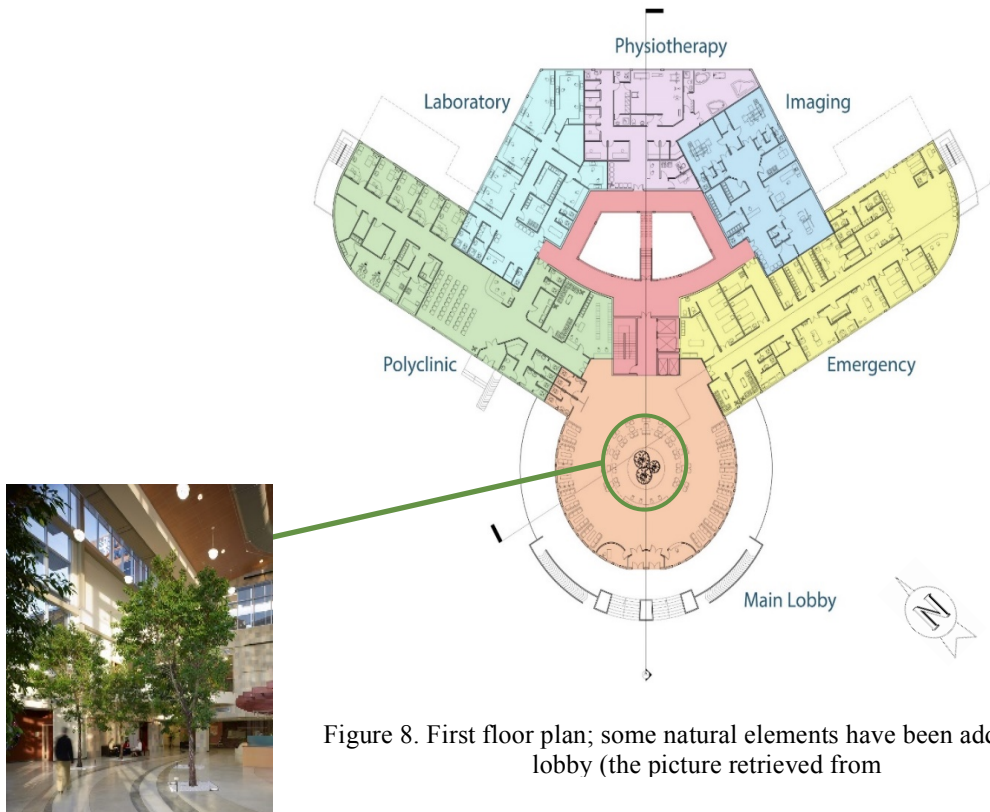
First floor plan; some natural elements have been added to the lobby (the picture retrieved from
